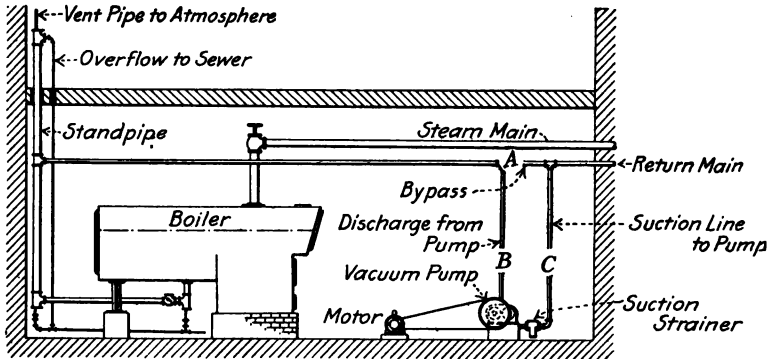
GENERAL ARRANGEMENT OF PIPING FOR VACUUM SYSTEM WITHOUT BOILER FEED PUMP
